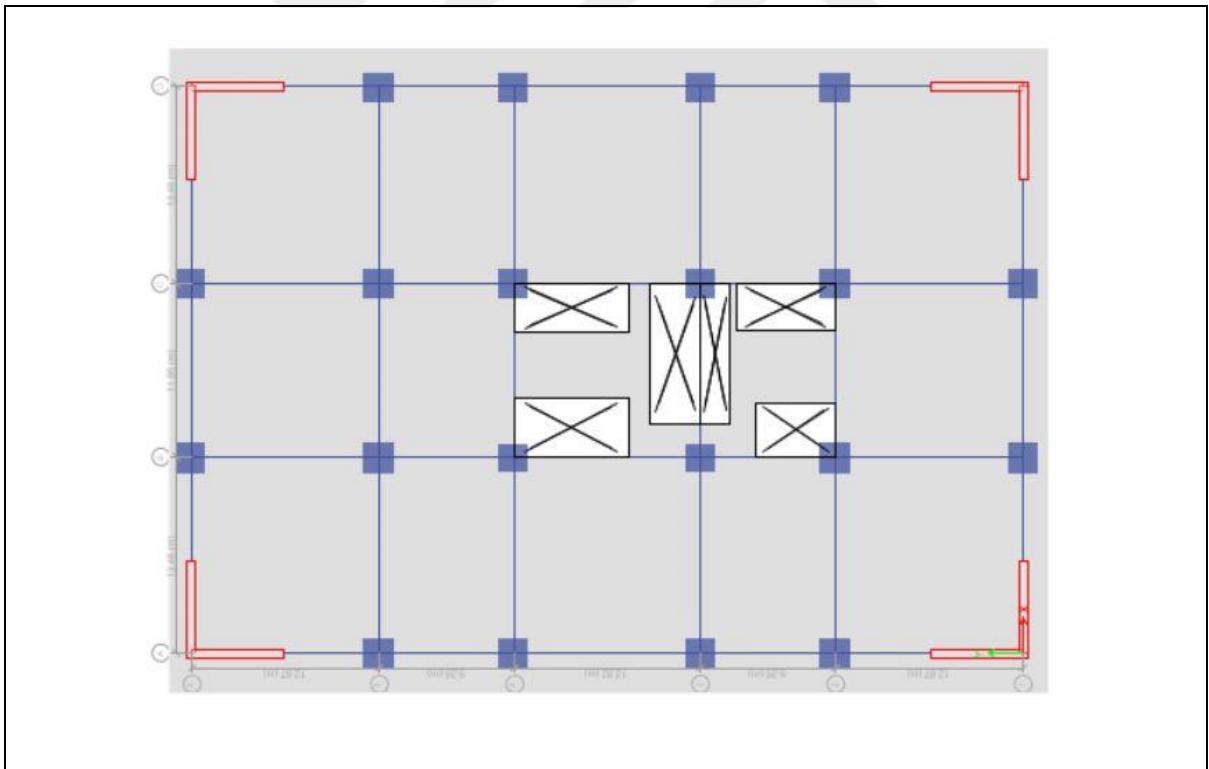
Shear Wall at Corner End Model (Case-3).
